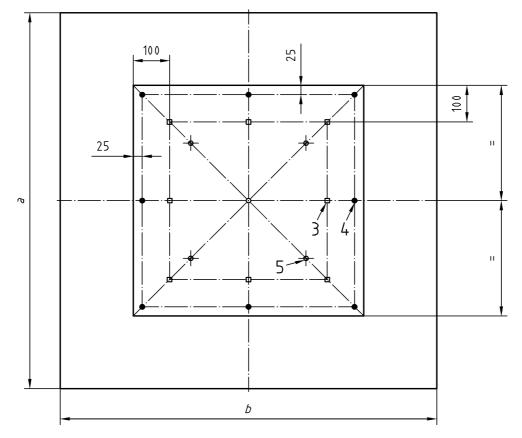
Closure and conveyor system assembly - arrangement of thermocouples on the unexposed side; example for vertical installation C
